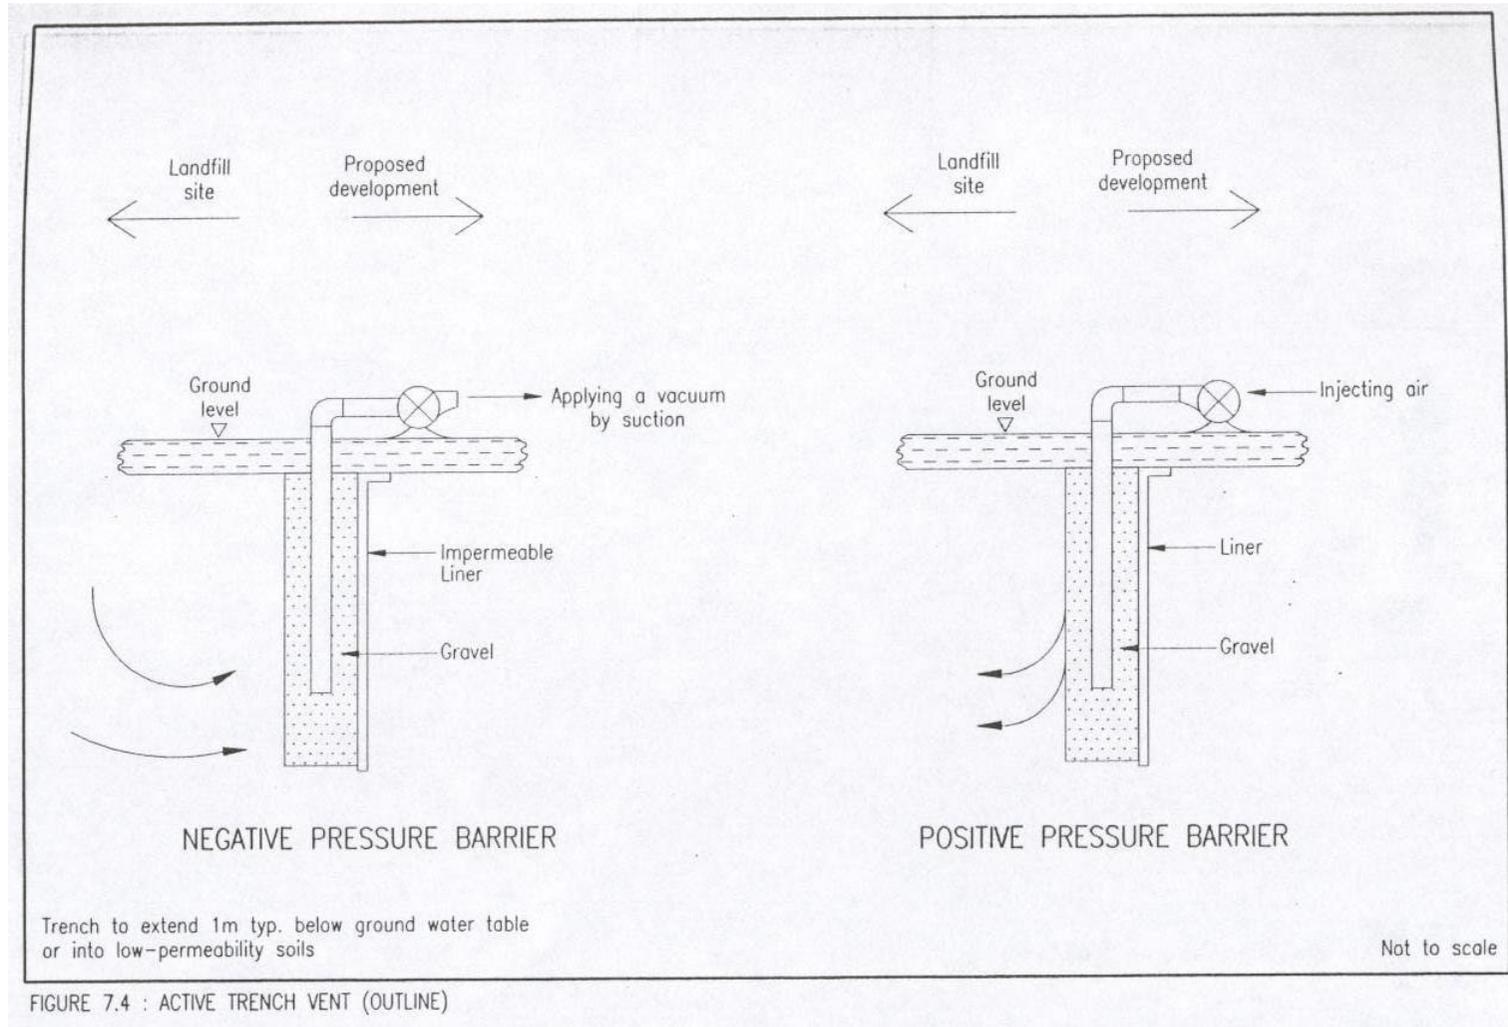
ACTIVE TRENCH VENT (OUTLINE)
